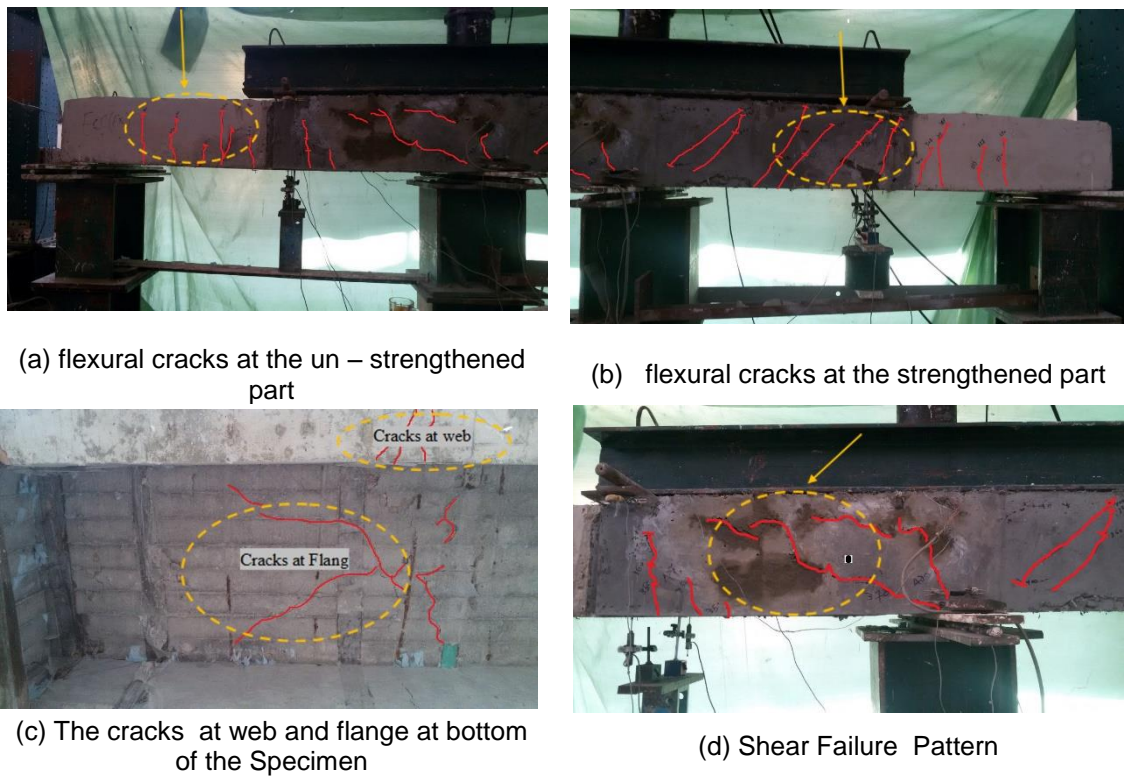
Cracks mapping and failure pattern of beam B-ECC.
